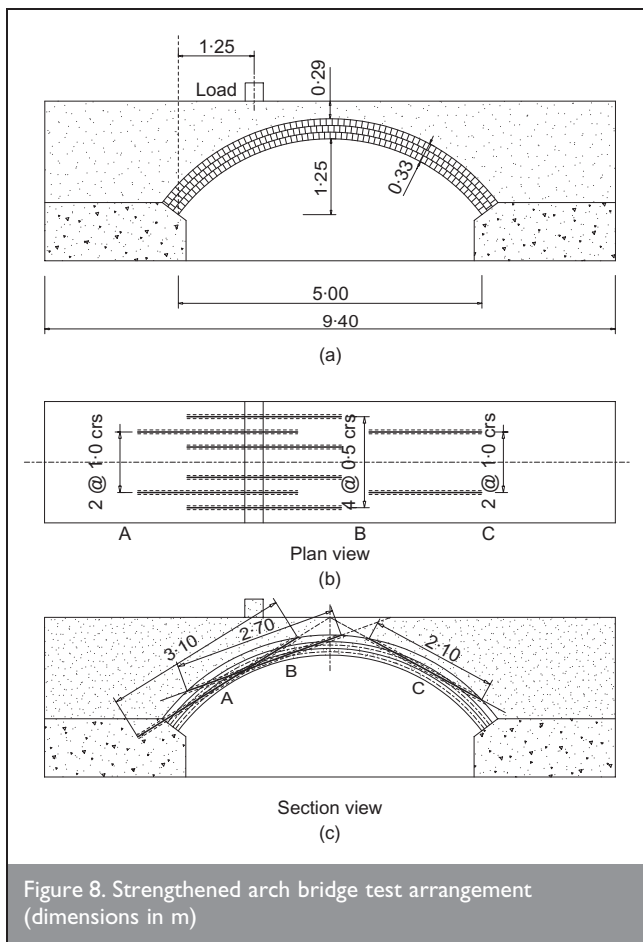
Strengthened arch bridge test arrangement (dimensions in m)
